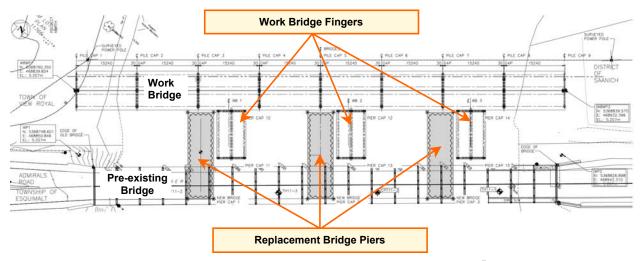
Temporary work bridge design plan view (designed by All-Span⁷ for Ruskin).
